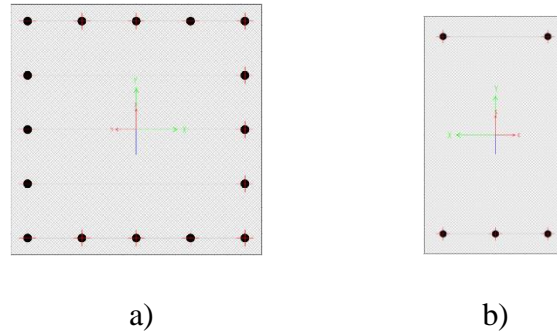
Section designer view of a) a representative column section b) The mid-span section of a representative beam
